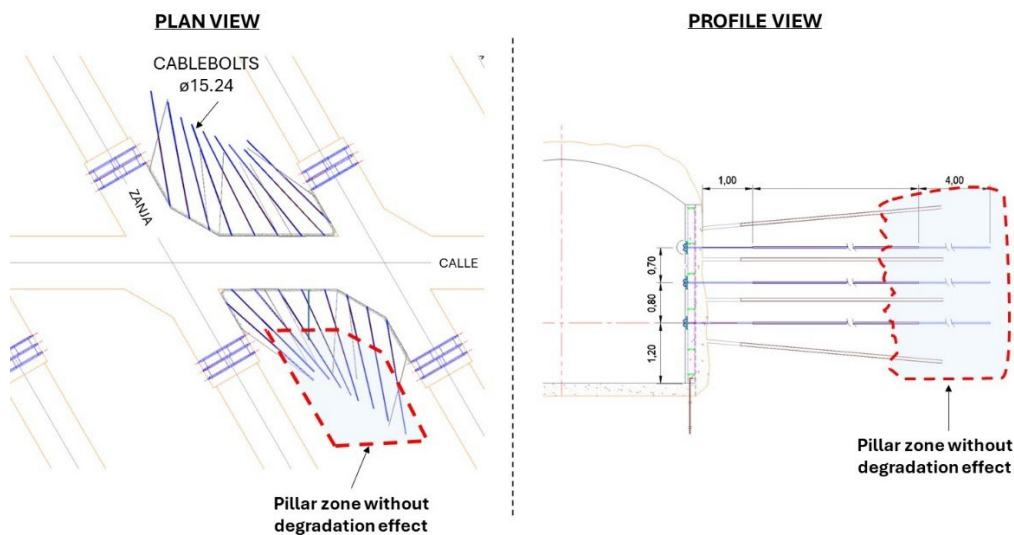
Plan and profile views of fortification design applied for preventive pillar reinforcement
